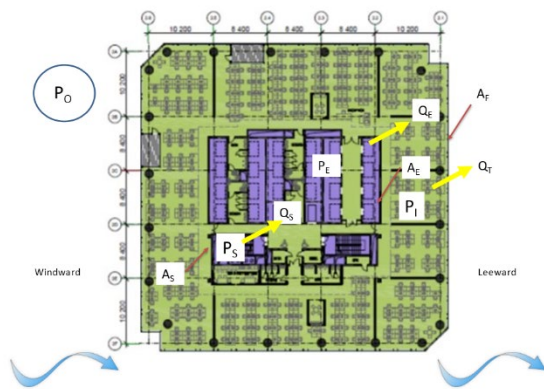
Typical floorplan of the building under consideration. There are two emergency staircases and two freight elevators
